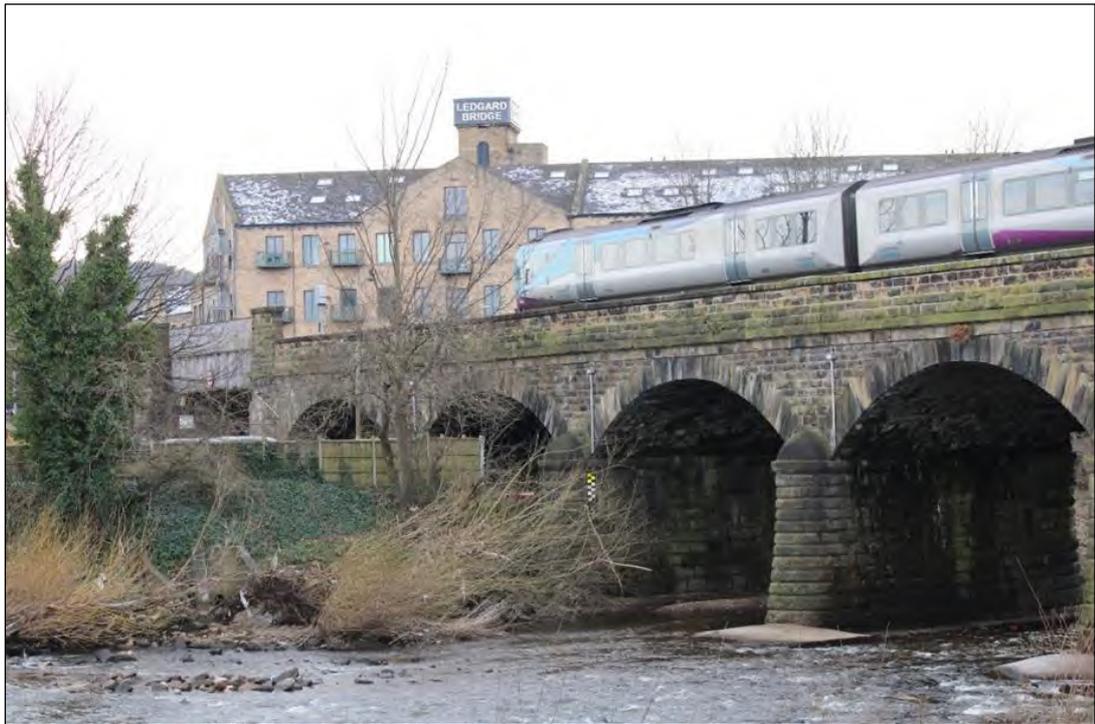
Northern elevation, spans 12 to 8 (west to east)
